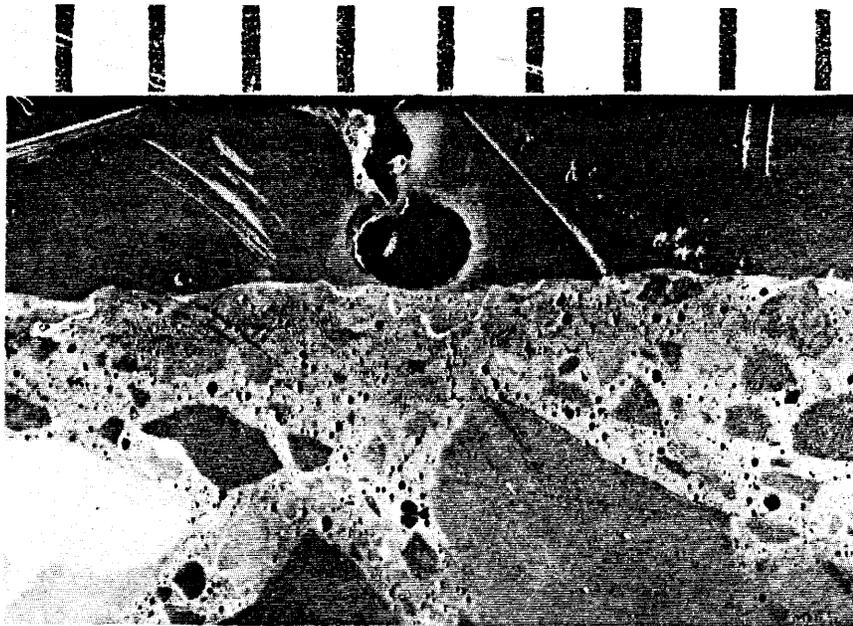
View of near surface of hardened concrete from sample 5-2. Note that fine cracking terminates at curing compound, which is intermixed with concrete. Large void at the top of the picture is in the epoxy mounting.
